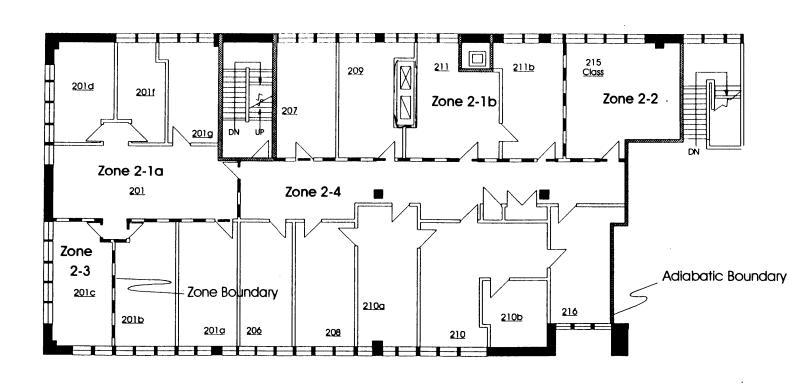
Building E51 - Second Floor Level Zoning Option 2B
